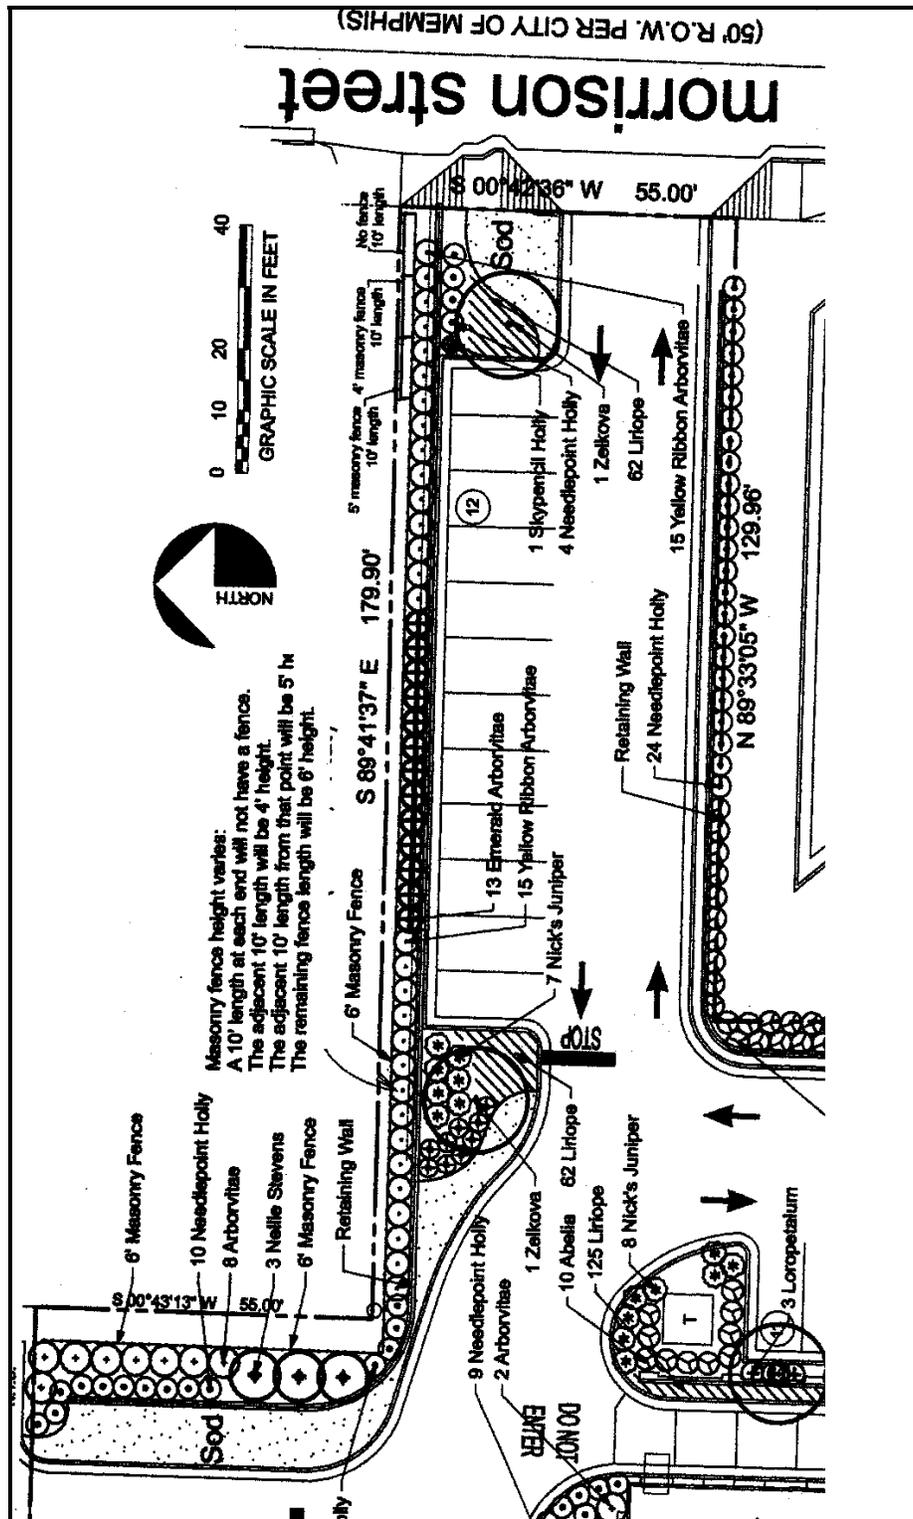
Proposed Landscaping Plan for Site with detail for the area in the R-MM district (Reoriented to fit page – north to the left; east at the top)
